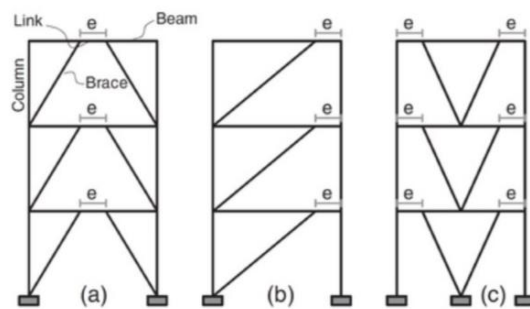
Eccentrically braced style used in the study. A) Eccentric Inverted V bracing, B) Eccentric Diagonal bracing, C) Eccentric V-bracing [20].
